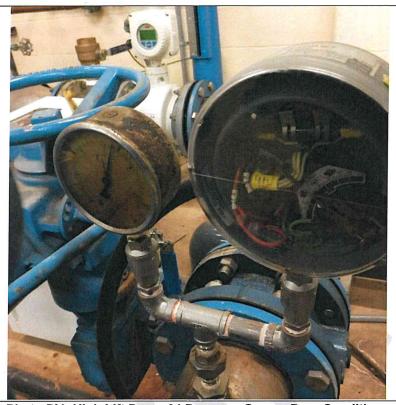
High Lift Pump 04 Pressure Gauge. Poor Condition.
